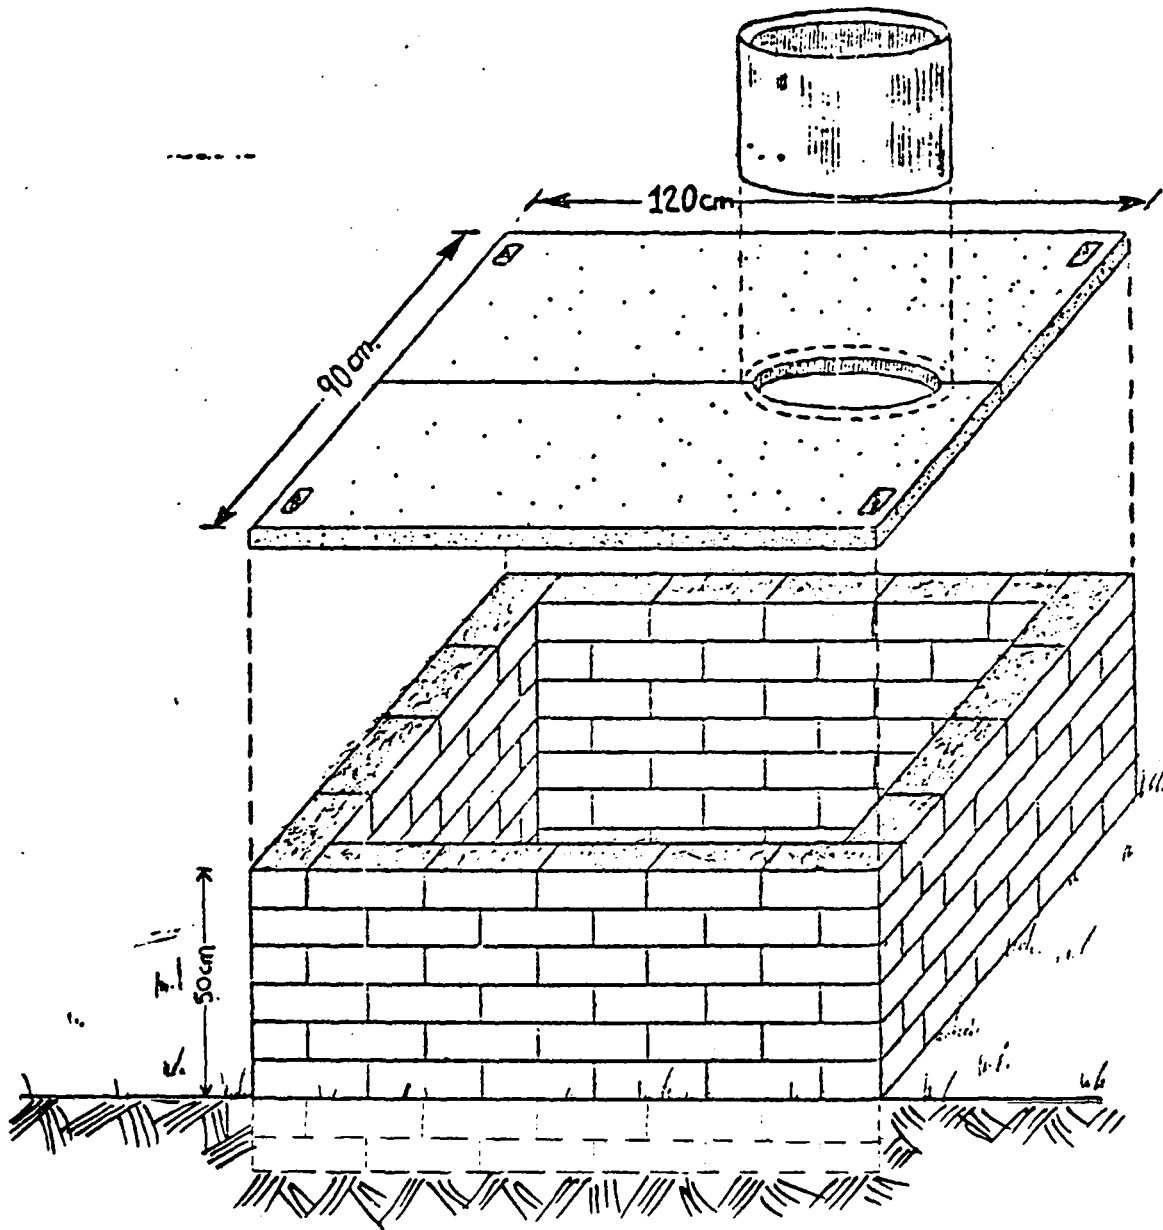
D. Installation of the concrete slab and seat on the pitcurb or "brocal".
